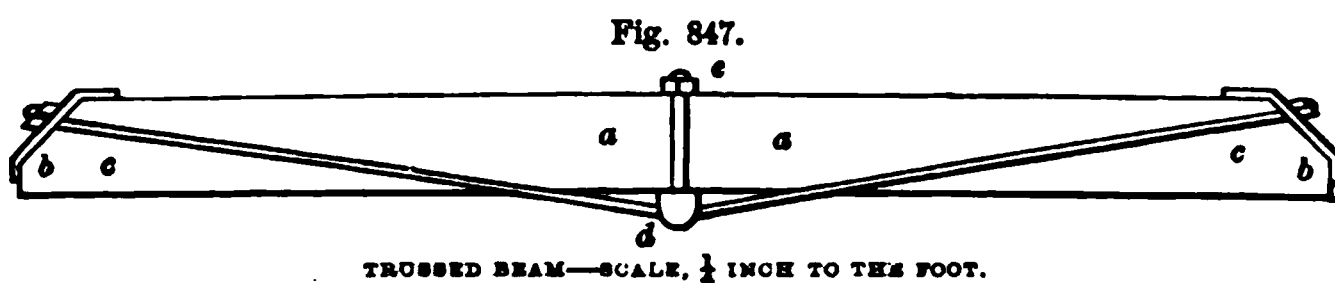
DETAILS OF TRUSSED BEAM—SCALE, 1 INCH TO THE FOOT
